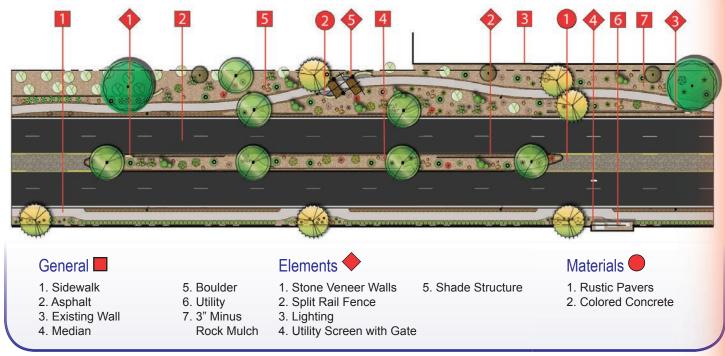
"Best" Rural Elegance Conceptual Streetscape Plan
